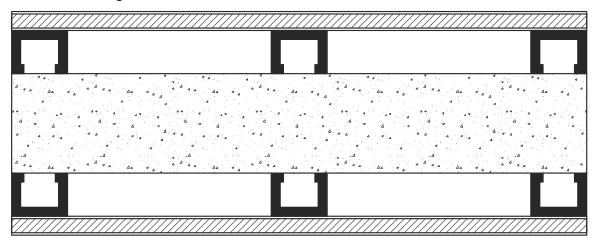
C5c: 200 mm thick concrete panel with one layer of 13 mm plasterboard or 13 mm cement render on each face
